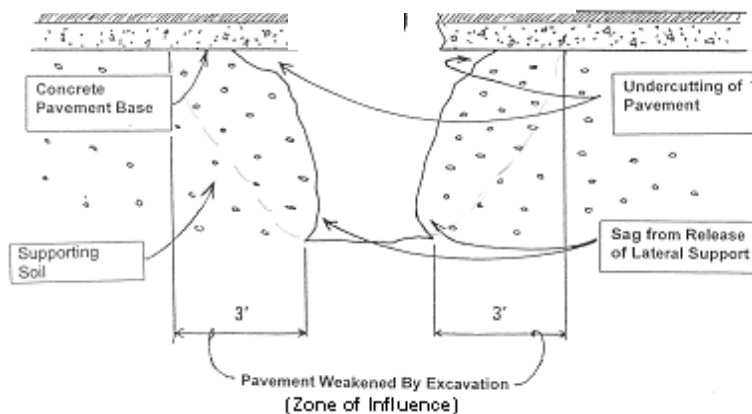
Overstressing of the pavement and natural materials adjacent to the trench
